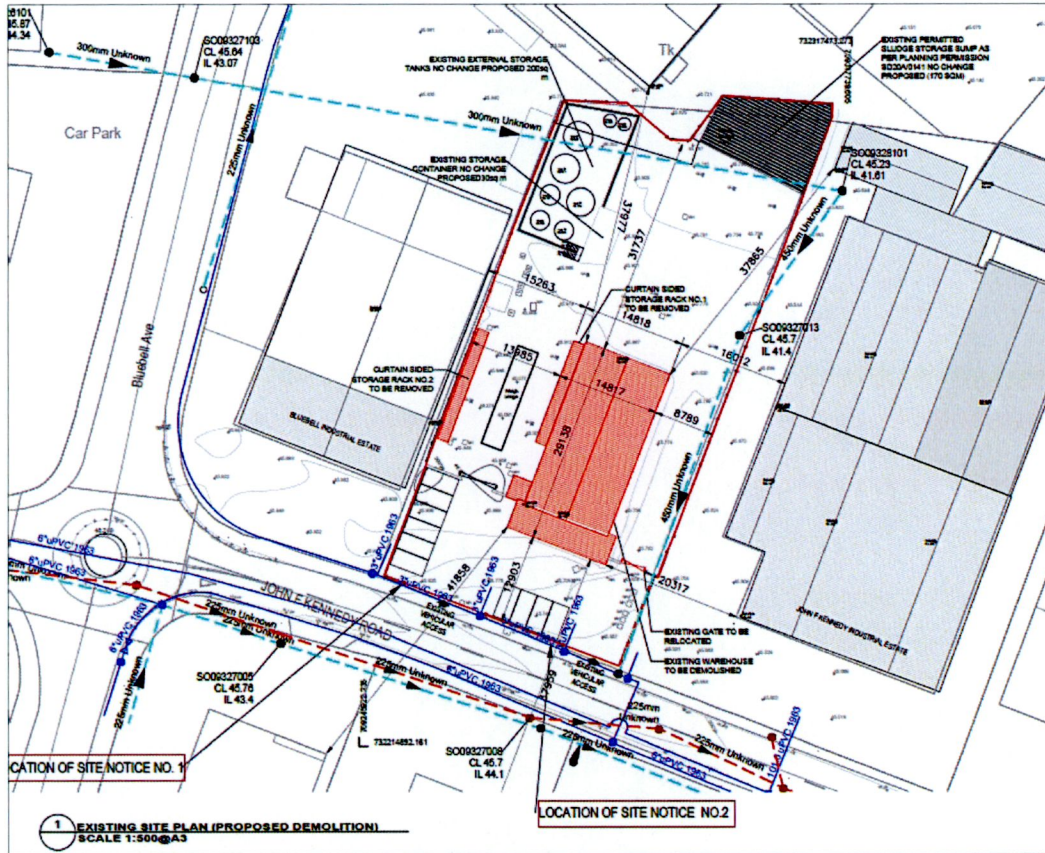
Existing Site Plan (Drawing No.: B0125-A-002)
